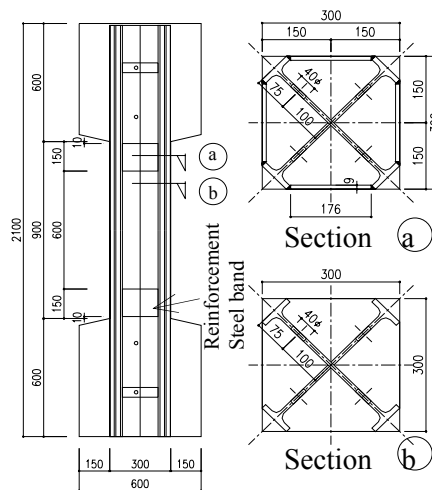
Section of Specimen and the Sectional Form [B-5,B-6]
